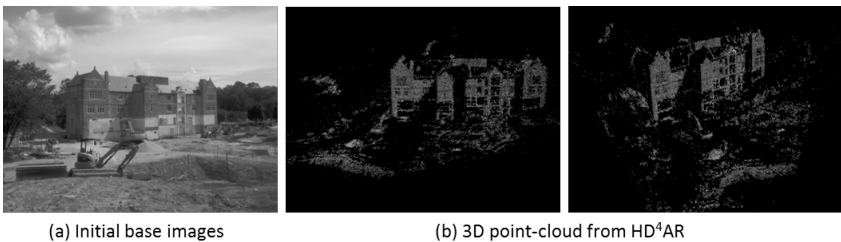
Example of 3D jobsite reconstruction result from the HD⁴AR.
